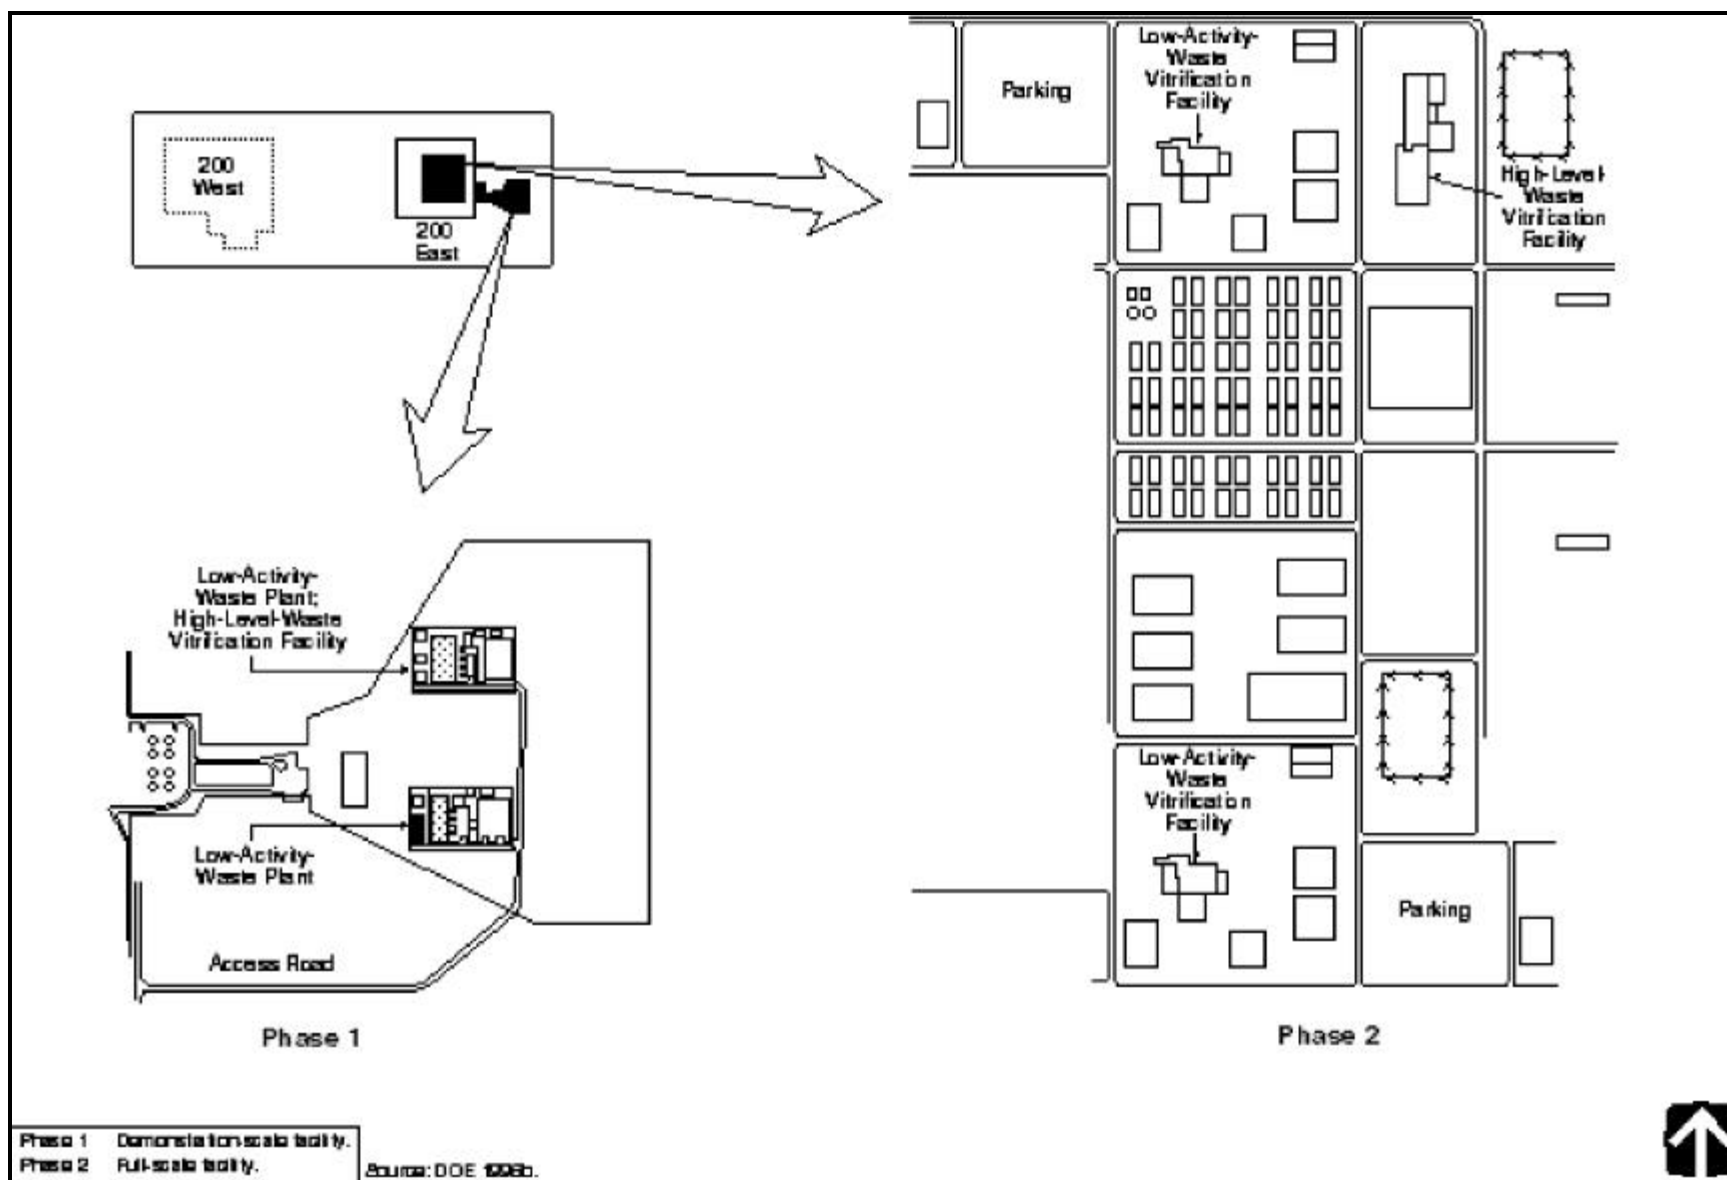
Location of Planned HLW Vitrification Facility in the 200 Area at Hanford
